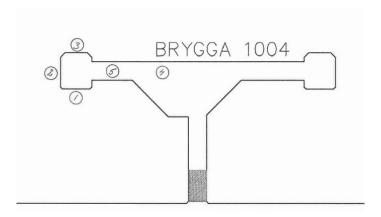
Schematic plan of the oil pier showing the location of the sampling points selected for inspection. Point 3 is facing the open sea from the north.
